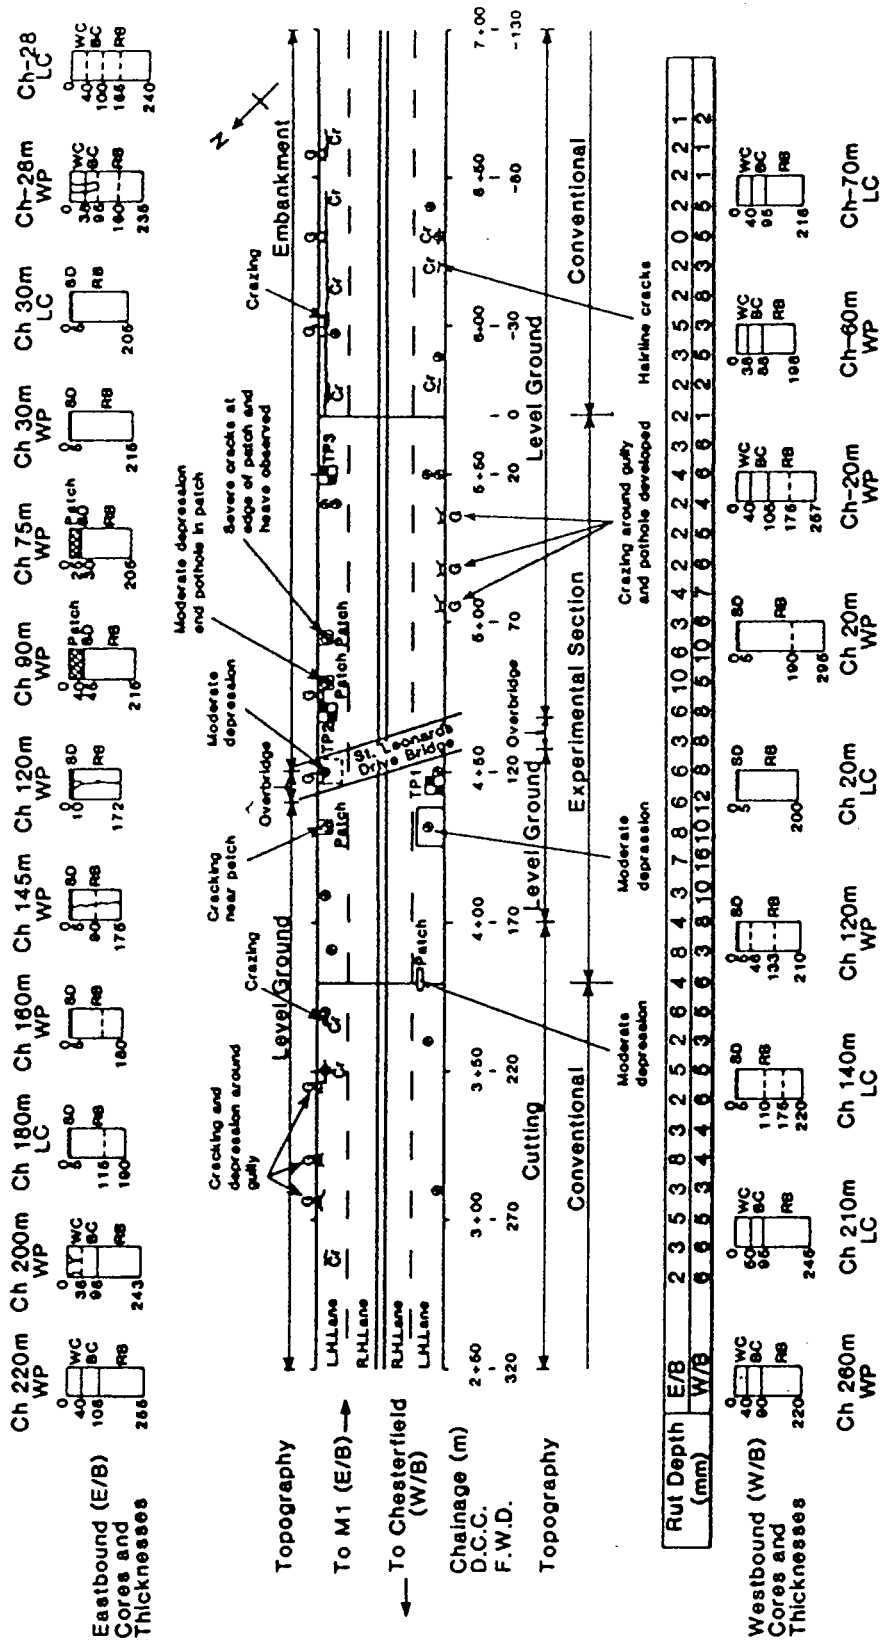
PLAN SHOWING DETAILED LAYOUT AND STRUCTURAL CONDITIONS OF TEST SECTIONS, A617 HASLAND BYPASS, DERBYSHIRE
